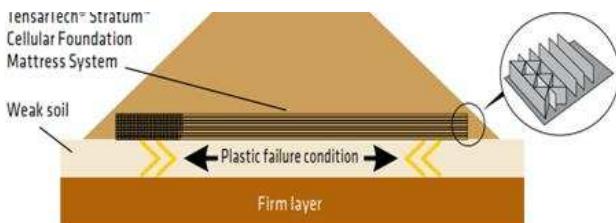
Typical section through embankment constructed on Cellular Foundation Mattress System.
